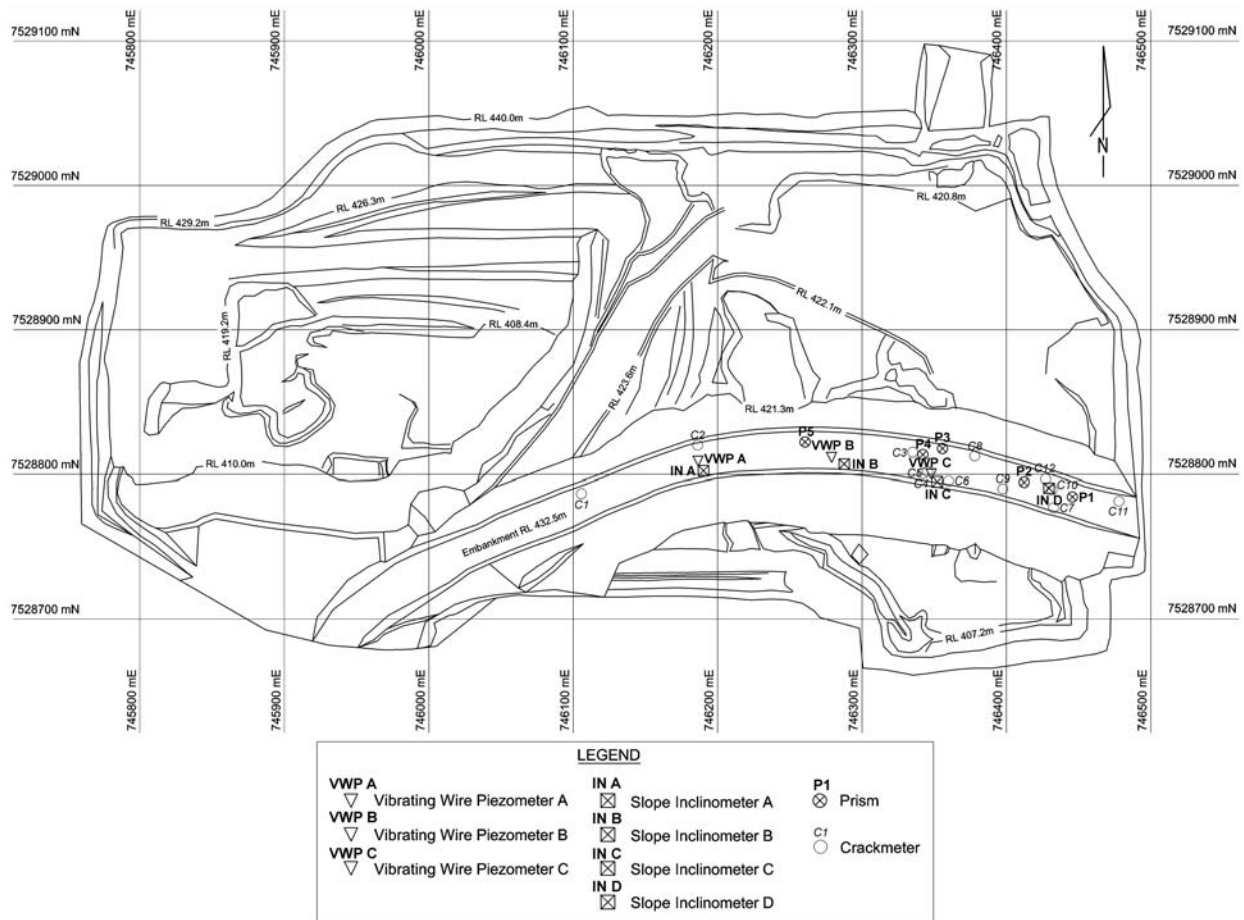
Instrumentation layout at the Daydream in-pit TSF embankment
